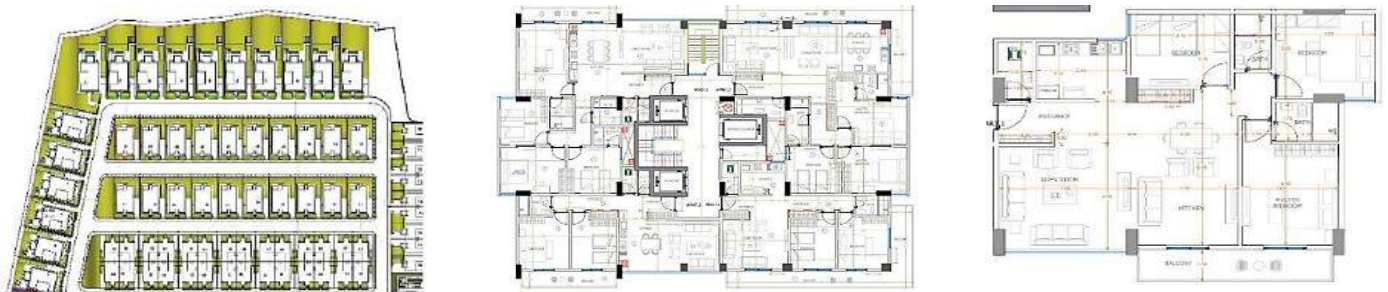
French Village 1 Site Plan, Apartment Floor Plan, and Three-Bedroom Floor Plan
